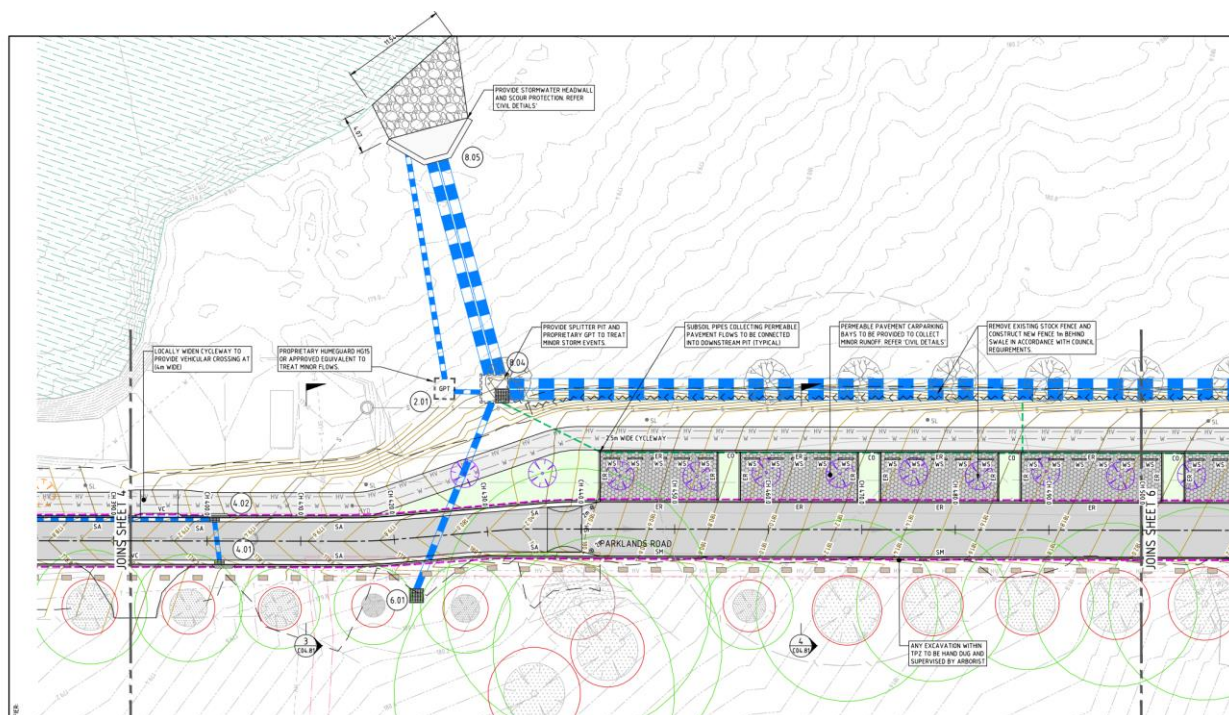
Parklands Road: Upper dam to McCabe Road (Source: Northrop)
